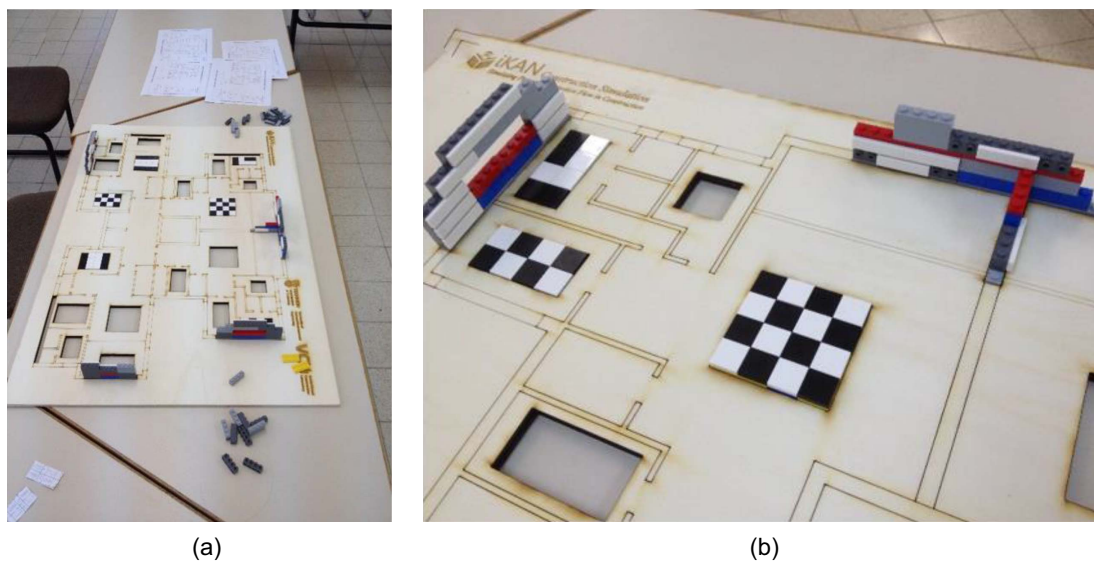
Wall and floor models example: (a) drywalls, electrical conduits, water pipes, and wall tiles; and (b) floor model example.
